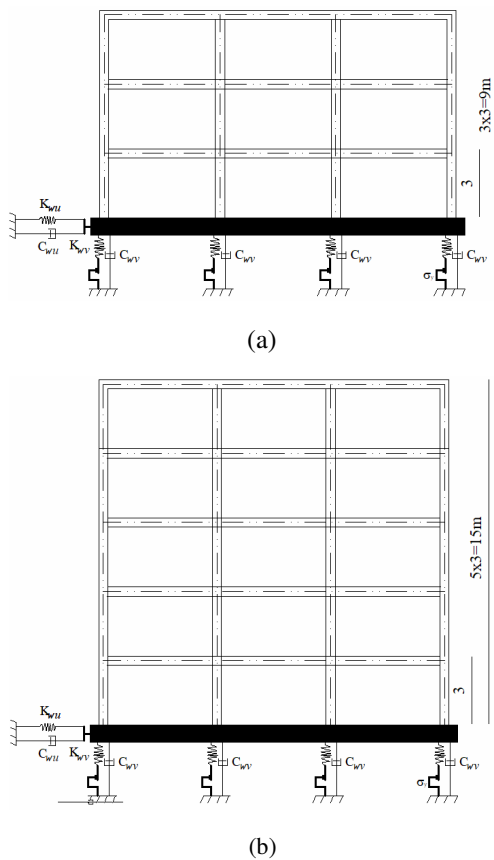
Frames of the three (a) and five (b) stories reinforced concrete buildings considered in this work
